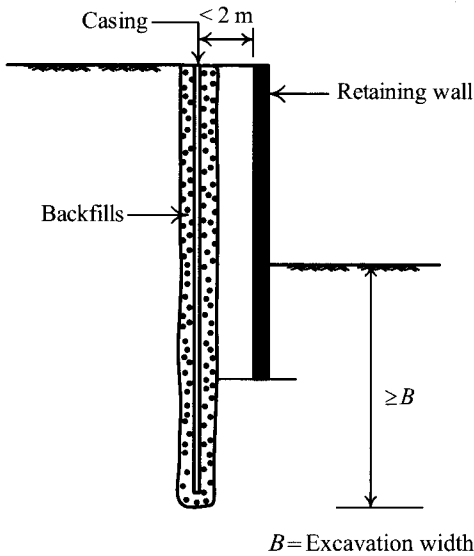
An inclinometer casing outside of the diaphragm wall.
